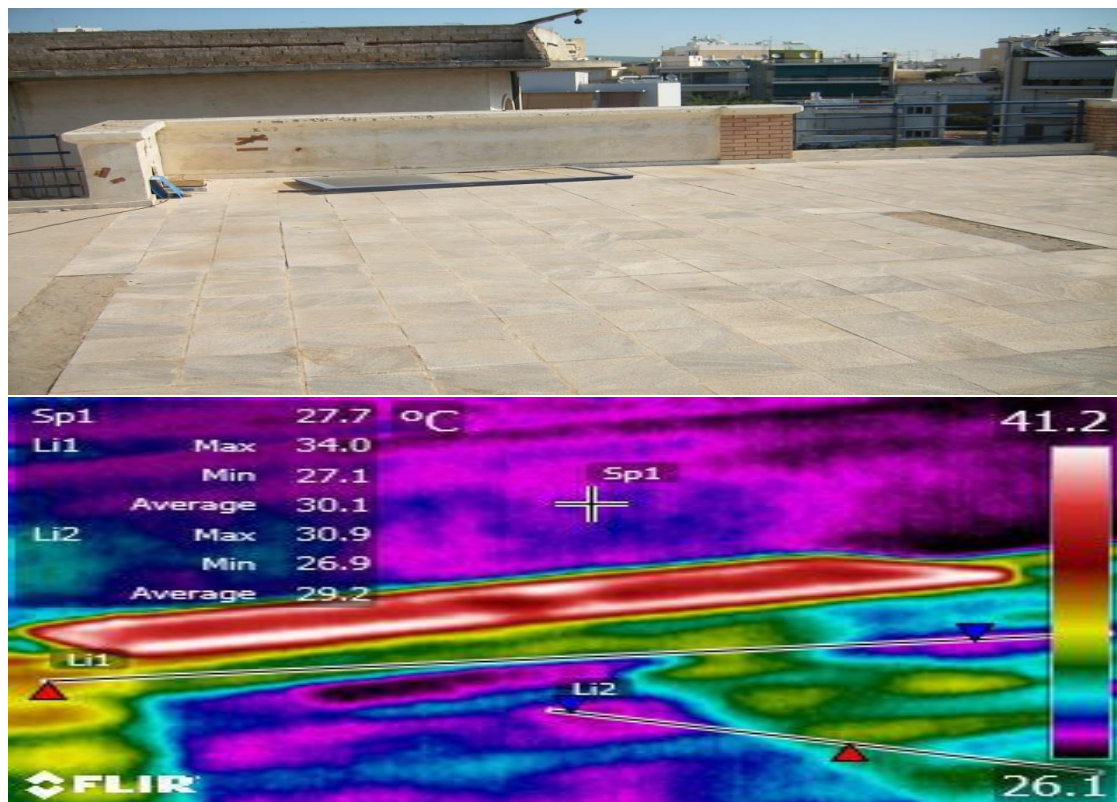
Thermal and visual photo of 3rd floor's roof tiles
